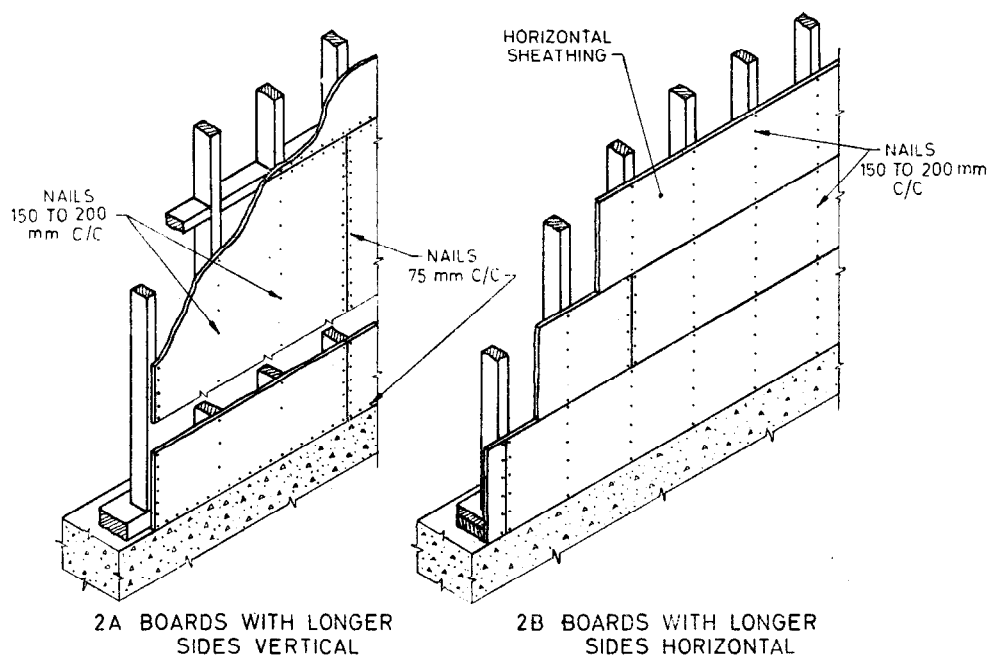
FIXING FIBREBOARD WALL SHEATHING
